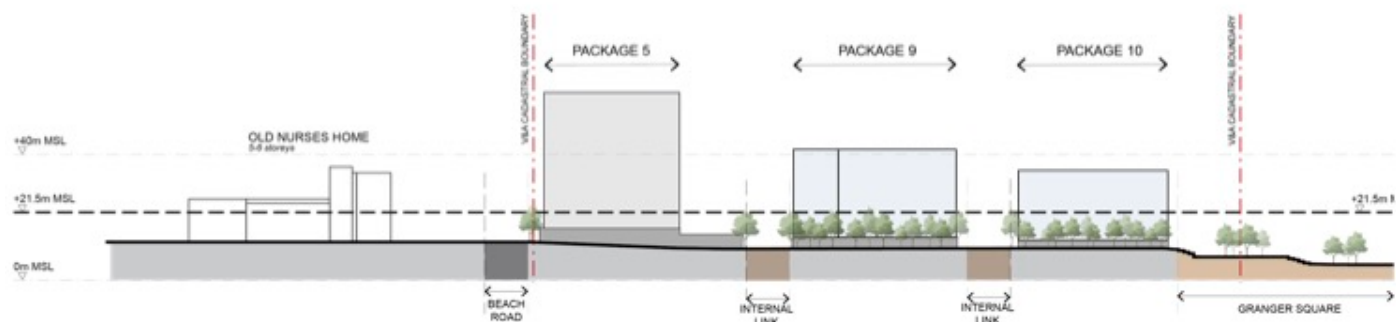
Section along Granger Bay Boulevard cascading of Building Heights towards the ocean (Source: V&A) (Package 5 is an unbuilt block with existing rights, outside the proposed development footprint)
